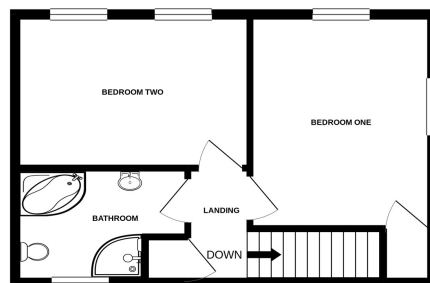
IMAGES & FLOORPLAN 5 LE VAUQUIEDOR COTTAGES
